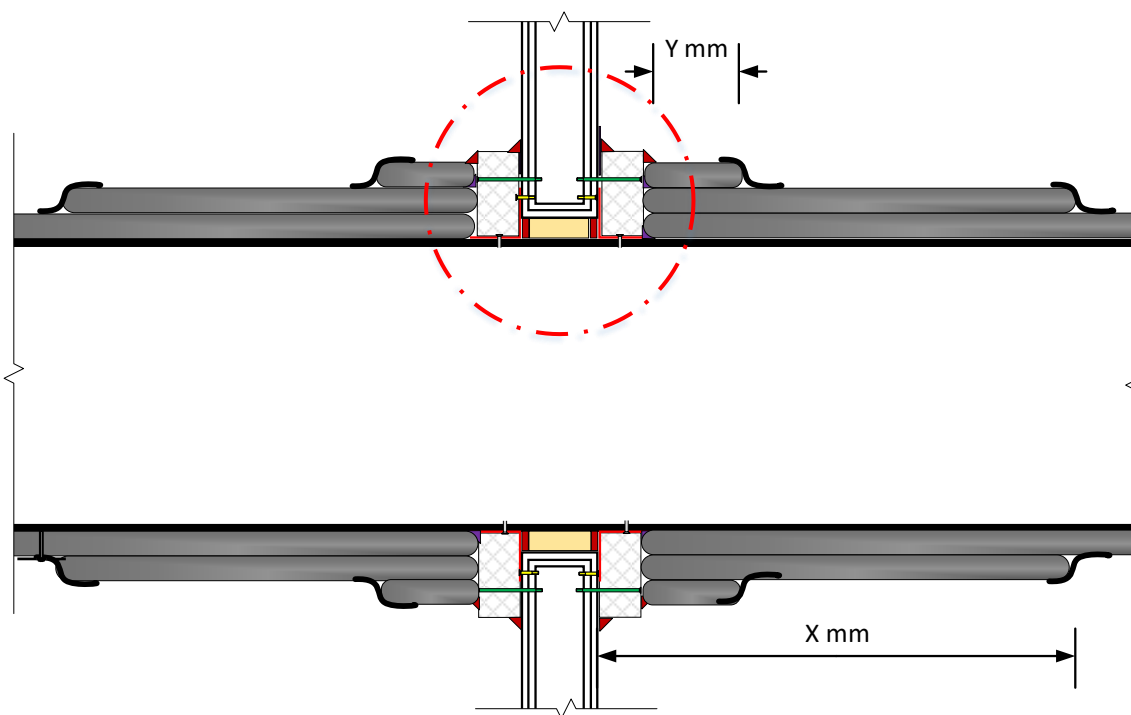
General Layering configuration. Note – layering and penetration detail is symmetrical about the separating element
